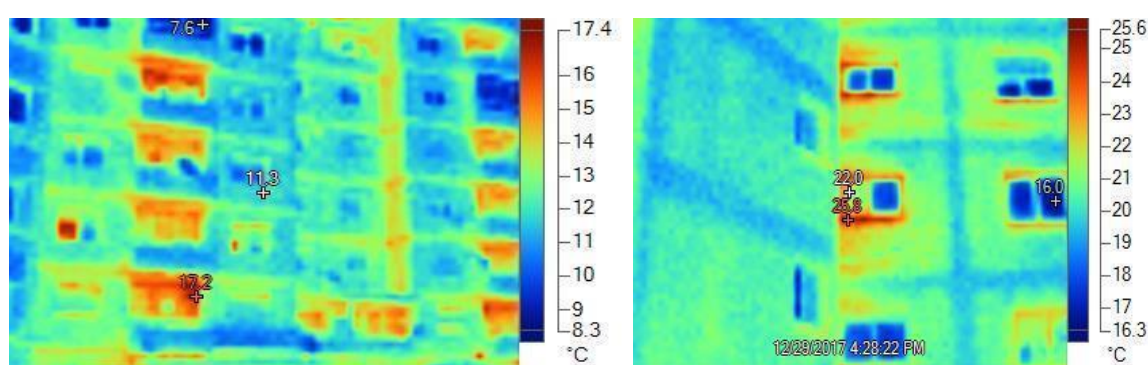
(a) Southeast elevation showing heat loss through the external wall, possibly due to insufficient building envelope insulation. Image taken 28/12/17 between 06:30 and 07:54 a.m. (b) Southeast elevation showing significant heat loss through windows and heat loss through wall junctions and cracks on building surface. Image taken 28/12/17 between 16:30 and 17:45 p.m.
